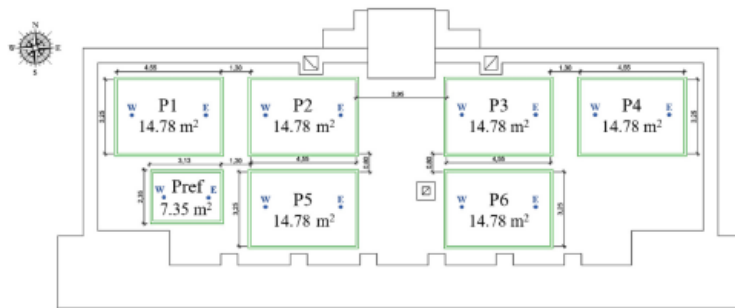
Roof plan with green roof plots. \*Note: E and W refer to East and West.
